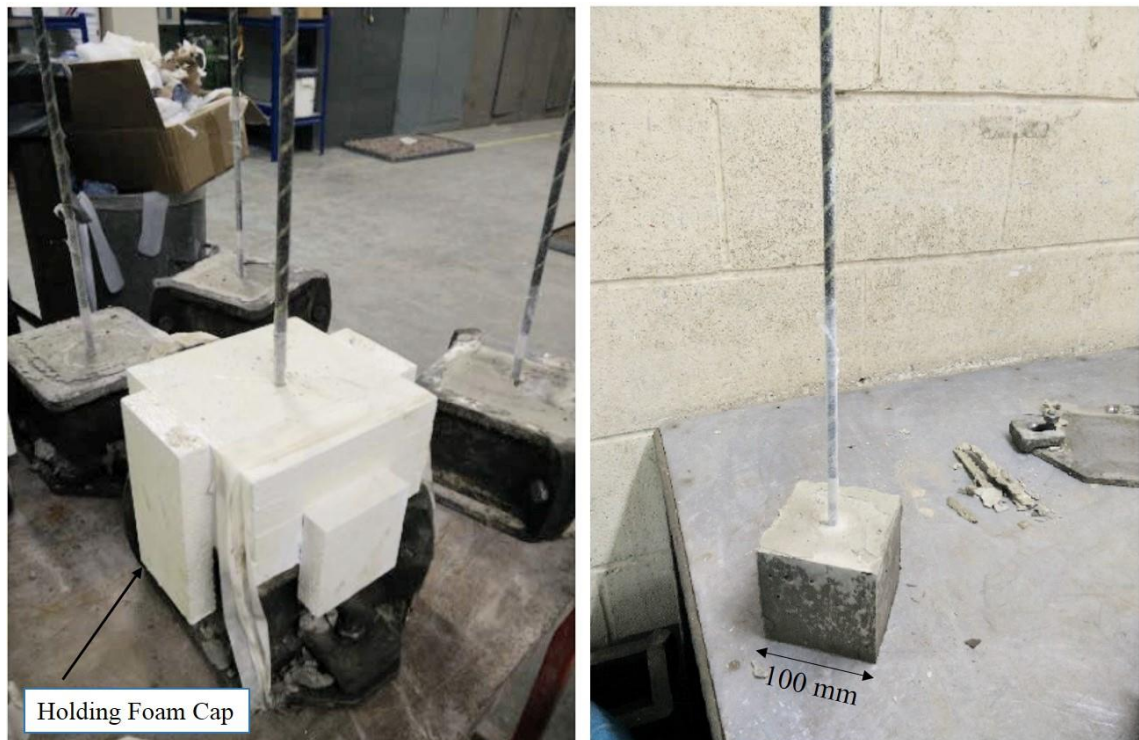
Casting of specimen for the pull-out test (left) and one specimen after being demoulded (right)
